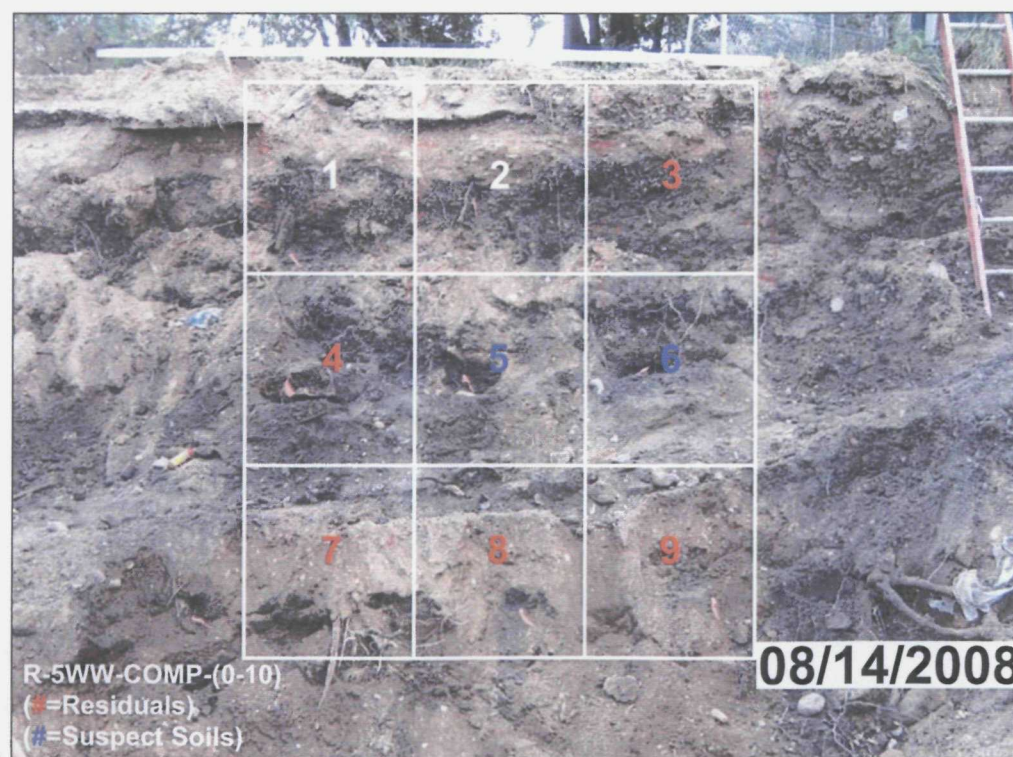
R-5 EXCAVATION AREA WESTERN SIDE WALL
